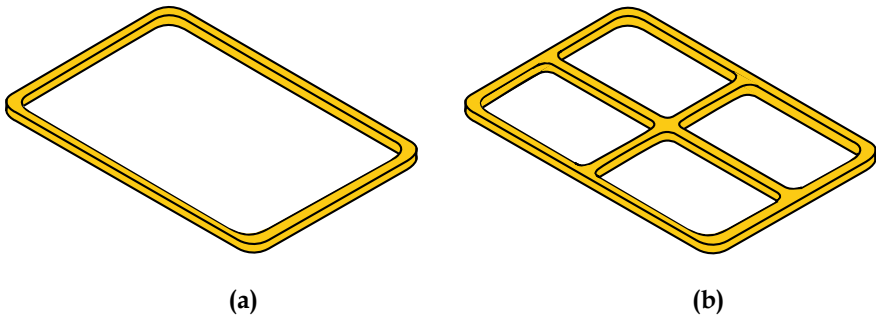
Prefabricated stirrups for use in concrete beams of *rectangular* cross-section: a 2-legged stirrups, and b 3-legged stirrups
